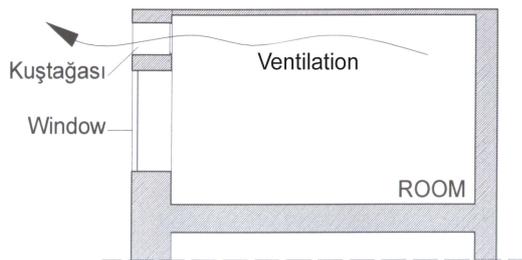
Section of a Gaziantep traditional room and air circulation with top window.
